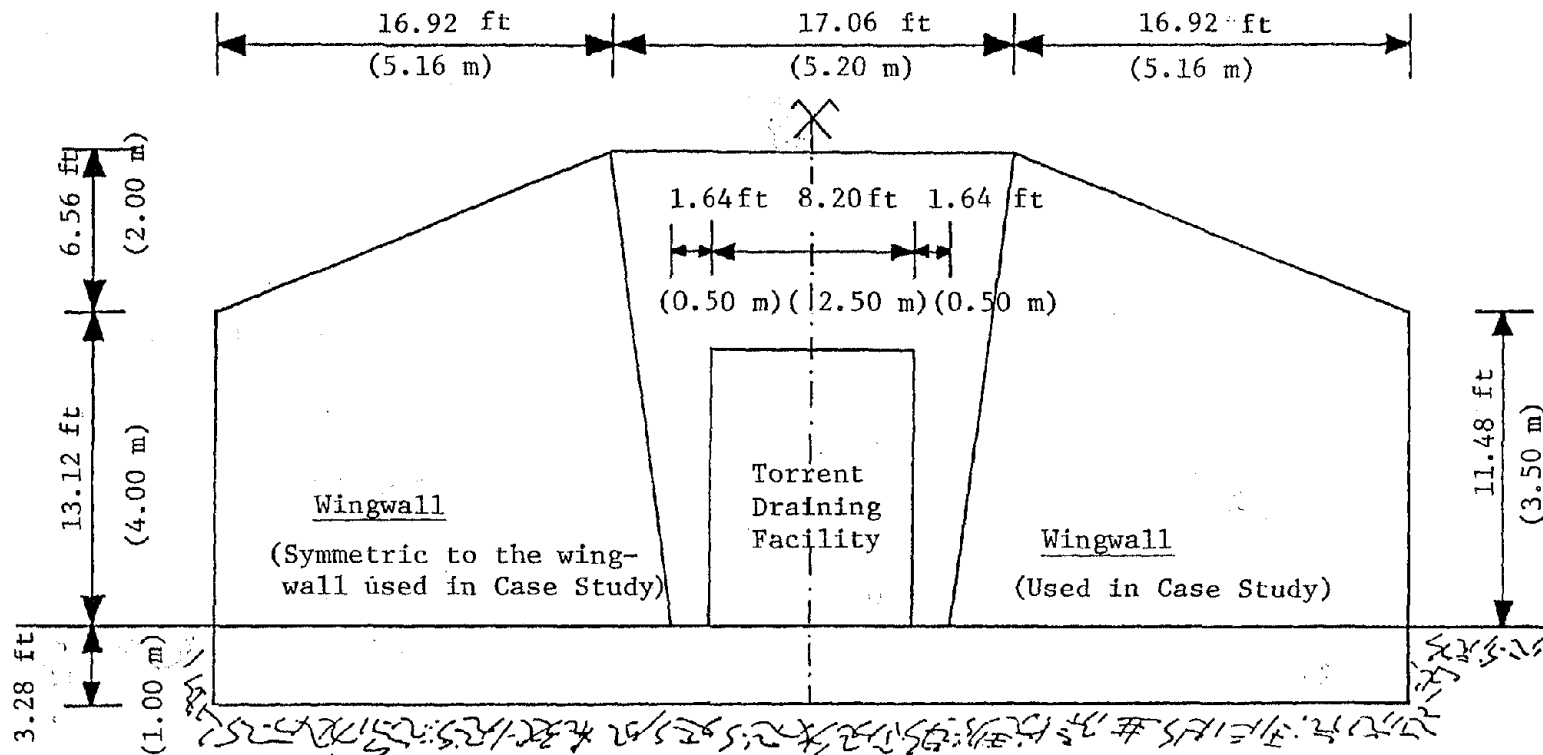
FRONT VIEW OF THE WINGWALL USED IN CASE STUDY AND ADJACENT FACILITIES
